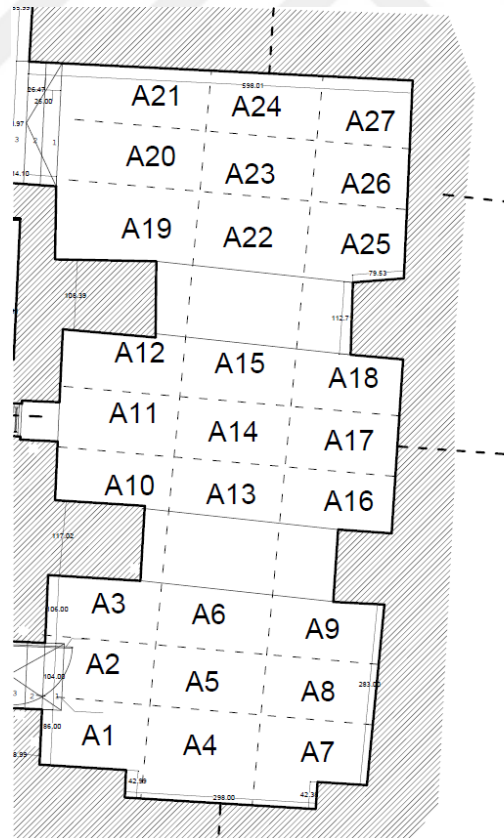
B5 Room plan (TEMA 2008, Organized by Author)
